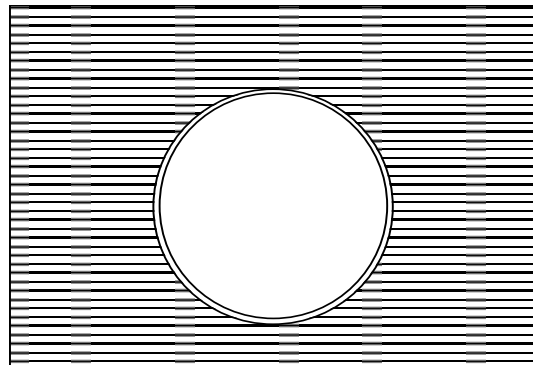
Tub surrounded by deck or on top of deck. If surrounded by a deck, the deck can hide the heating system plumbing. If on top of deck, the beauty of the tub can be better appreciated.
